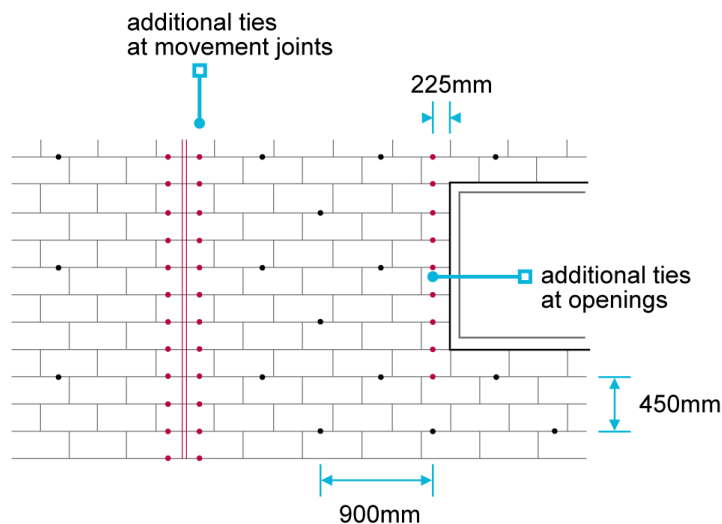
Typical Wall tie detail (Ref NHBC Standard 6.1.18)
